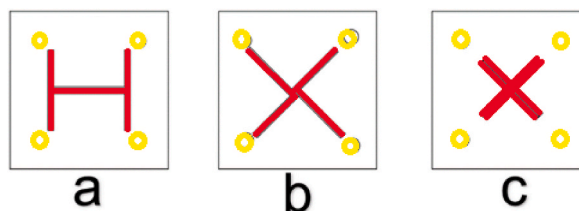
AutoCAD Schematic Drawing of the Specimens to be Compared. (a) Specimen 1, conventional composite concrete steel column with “W” steel column embedded. (b) Specimen 2, composite concrete steel column with 2 “L” steel angles embedded. (c) Specimen 3, composite steel column with 4 “L” steel angles embedded.
